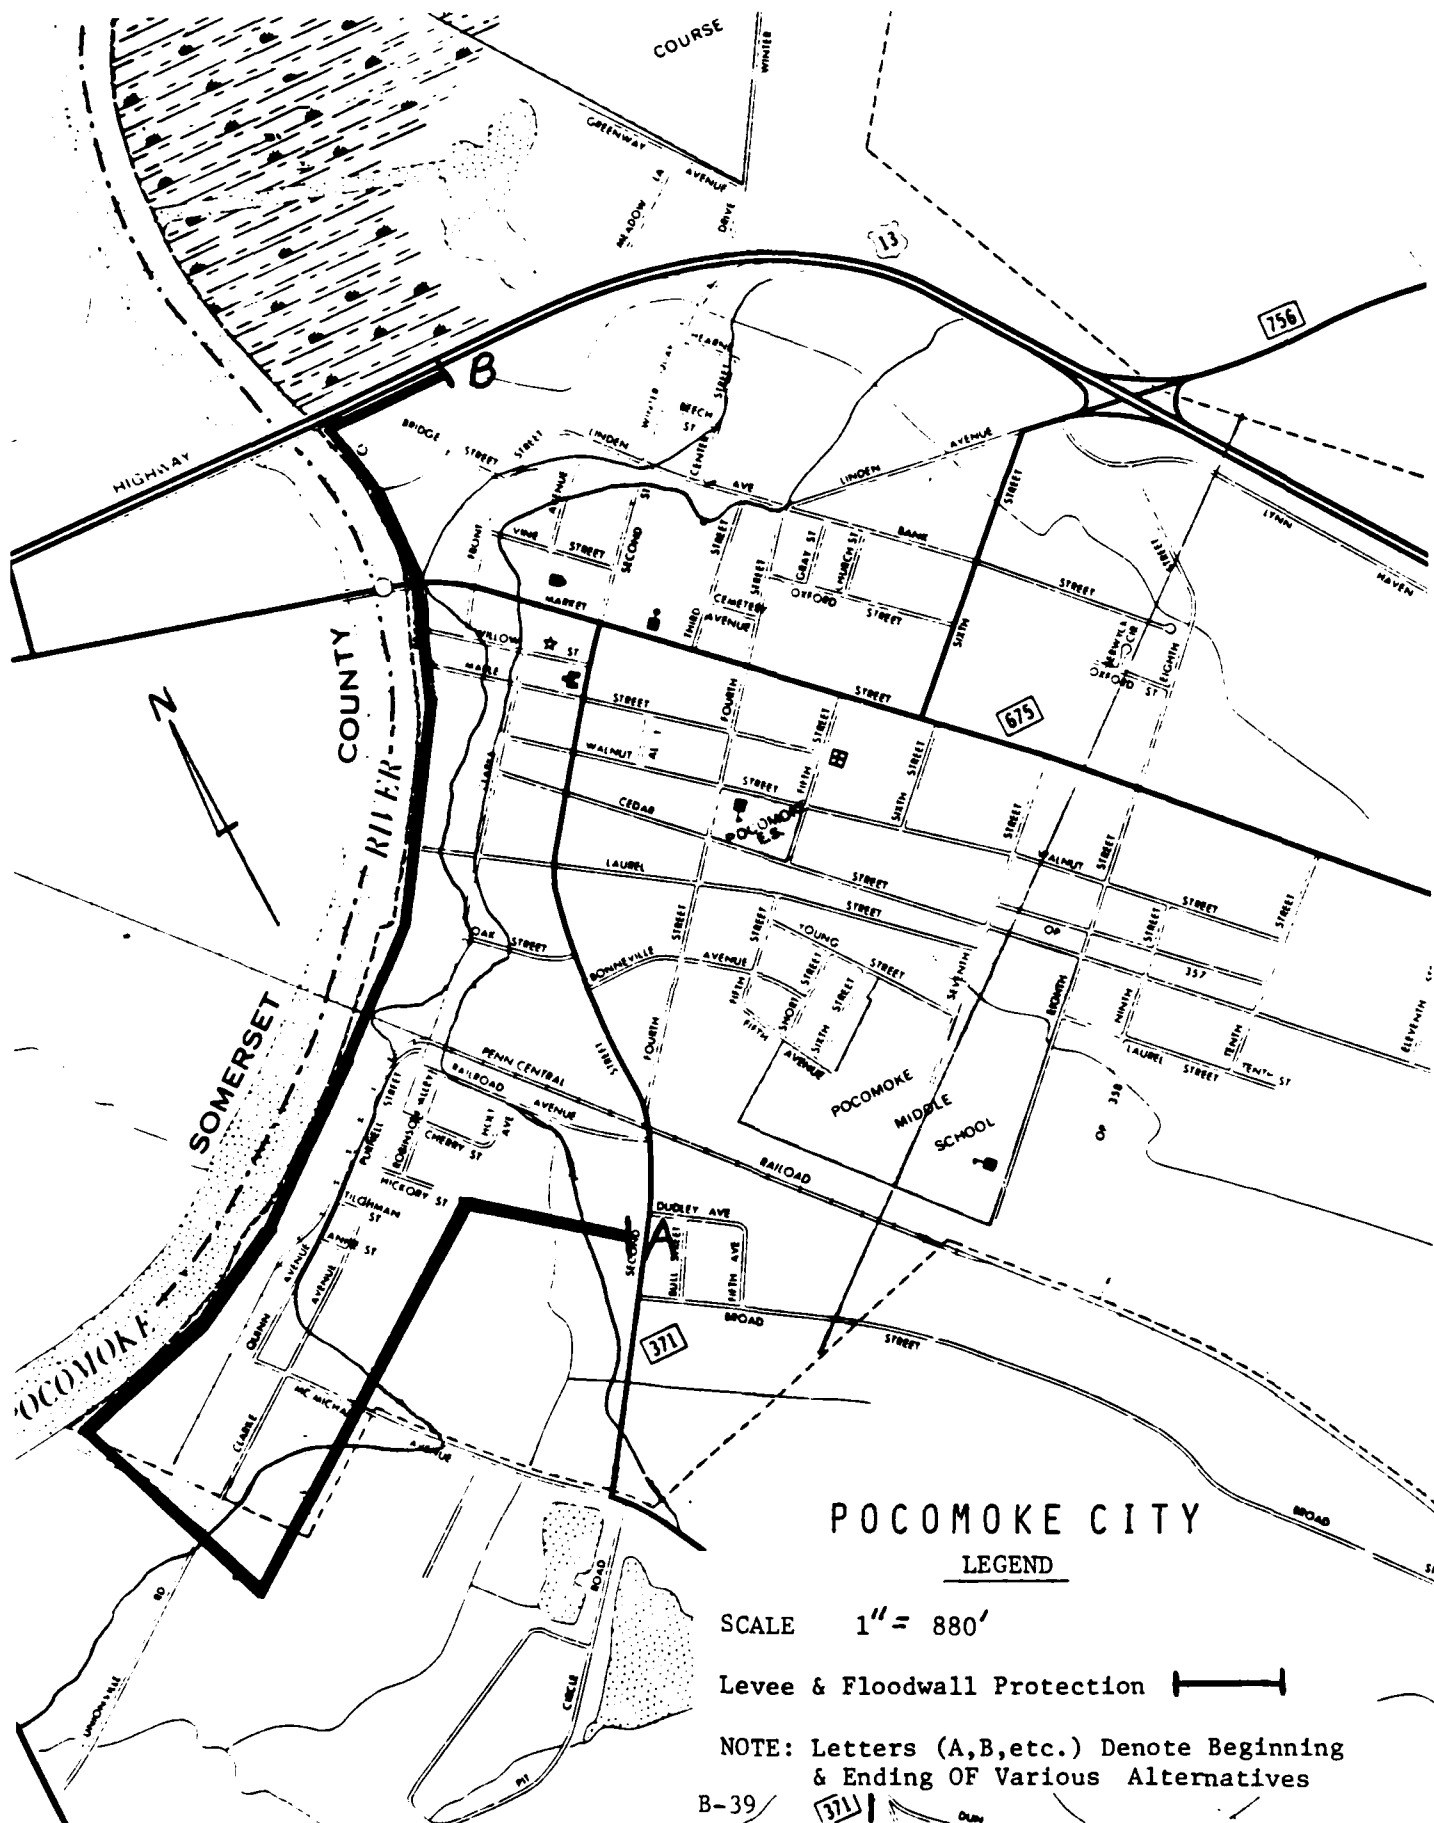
PLAN LOCATION OF STRUCTURAL MEASURES FOR POCOMOKE CITY, MARYLAND
